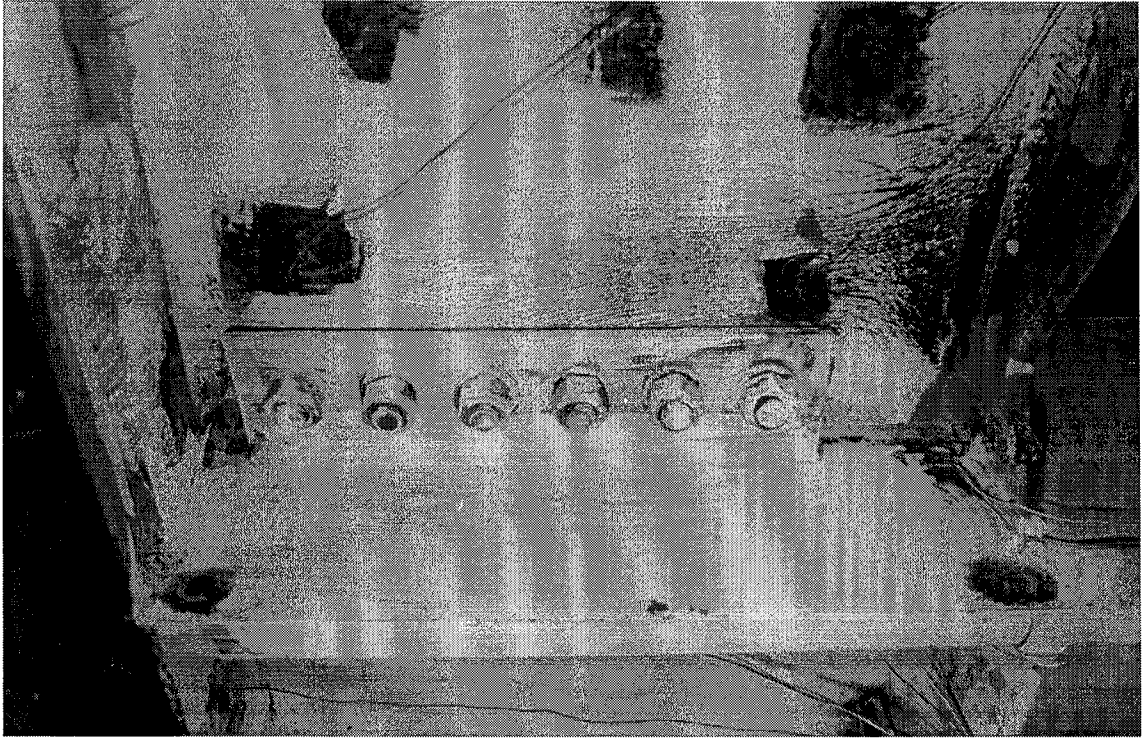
SE Connection Region (East Girder of Specimen 3)
